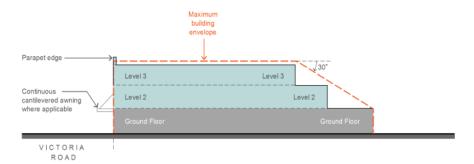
Victoria Road Drummoyne Area D - Maximum Building Envelope Section
